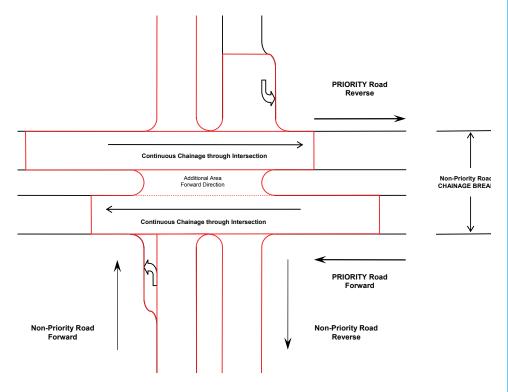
Schematic Sketch of Cross Road Intersection / Priority Road Convention
